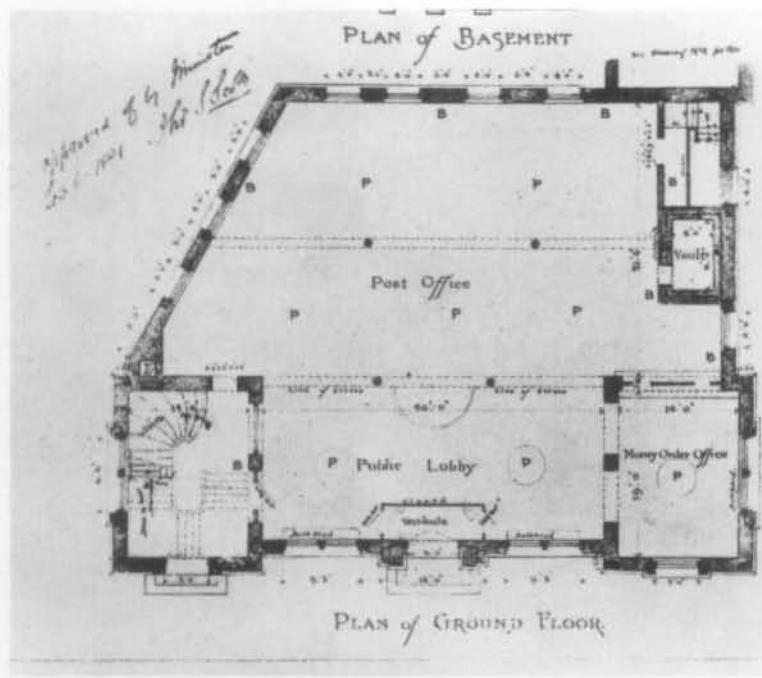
T. S. Scott, Post Office, Customs and Inland Revenue Building, Stratford Ont. Ground-floor plan & note signed by Scott, 8 Sept. 1881. (Photo: Public Archives of Canada).
